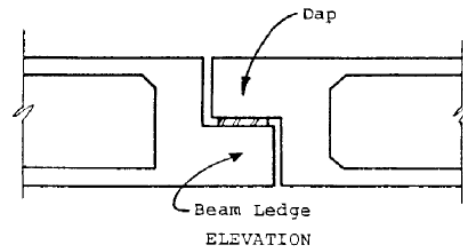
Dapped beam and beam ledge (AASHTO 2020)
